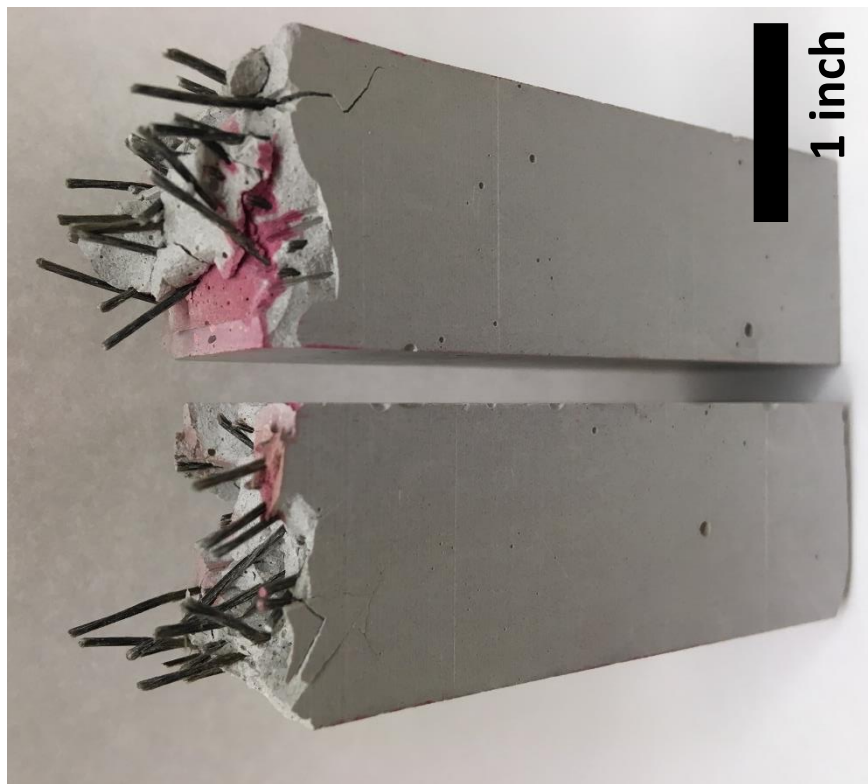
Fracture surfaces from samples after fracture toughness testing (left) KGPF and (right) KGPMB
